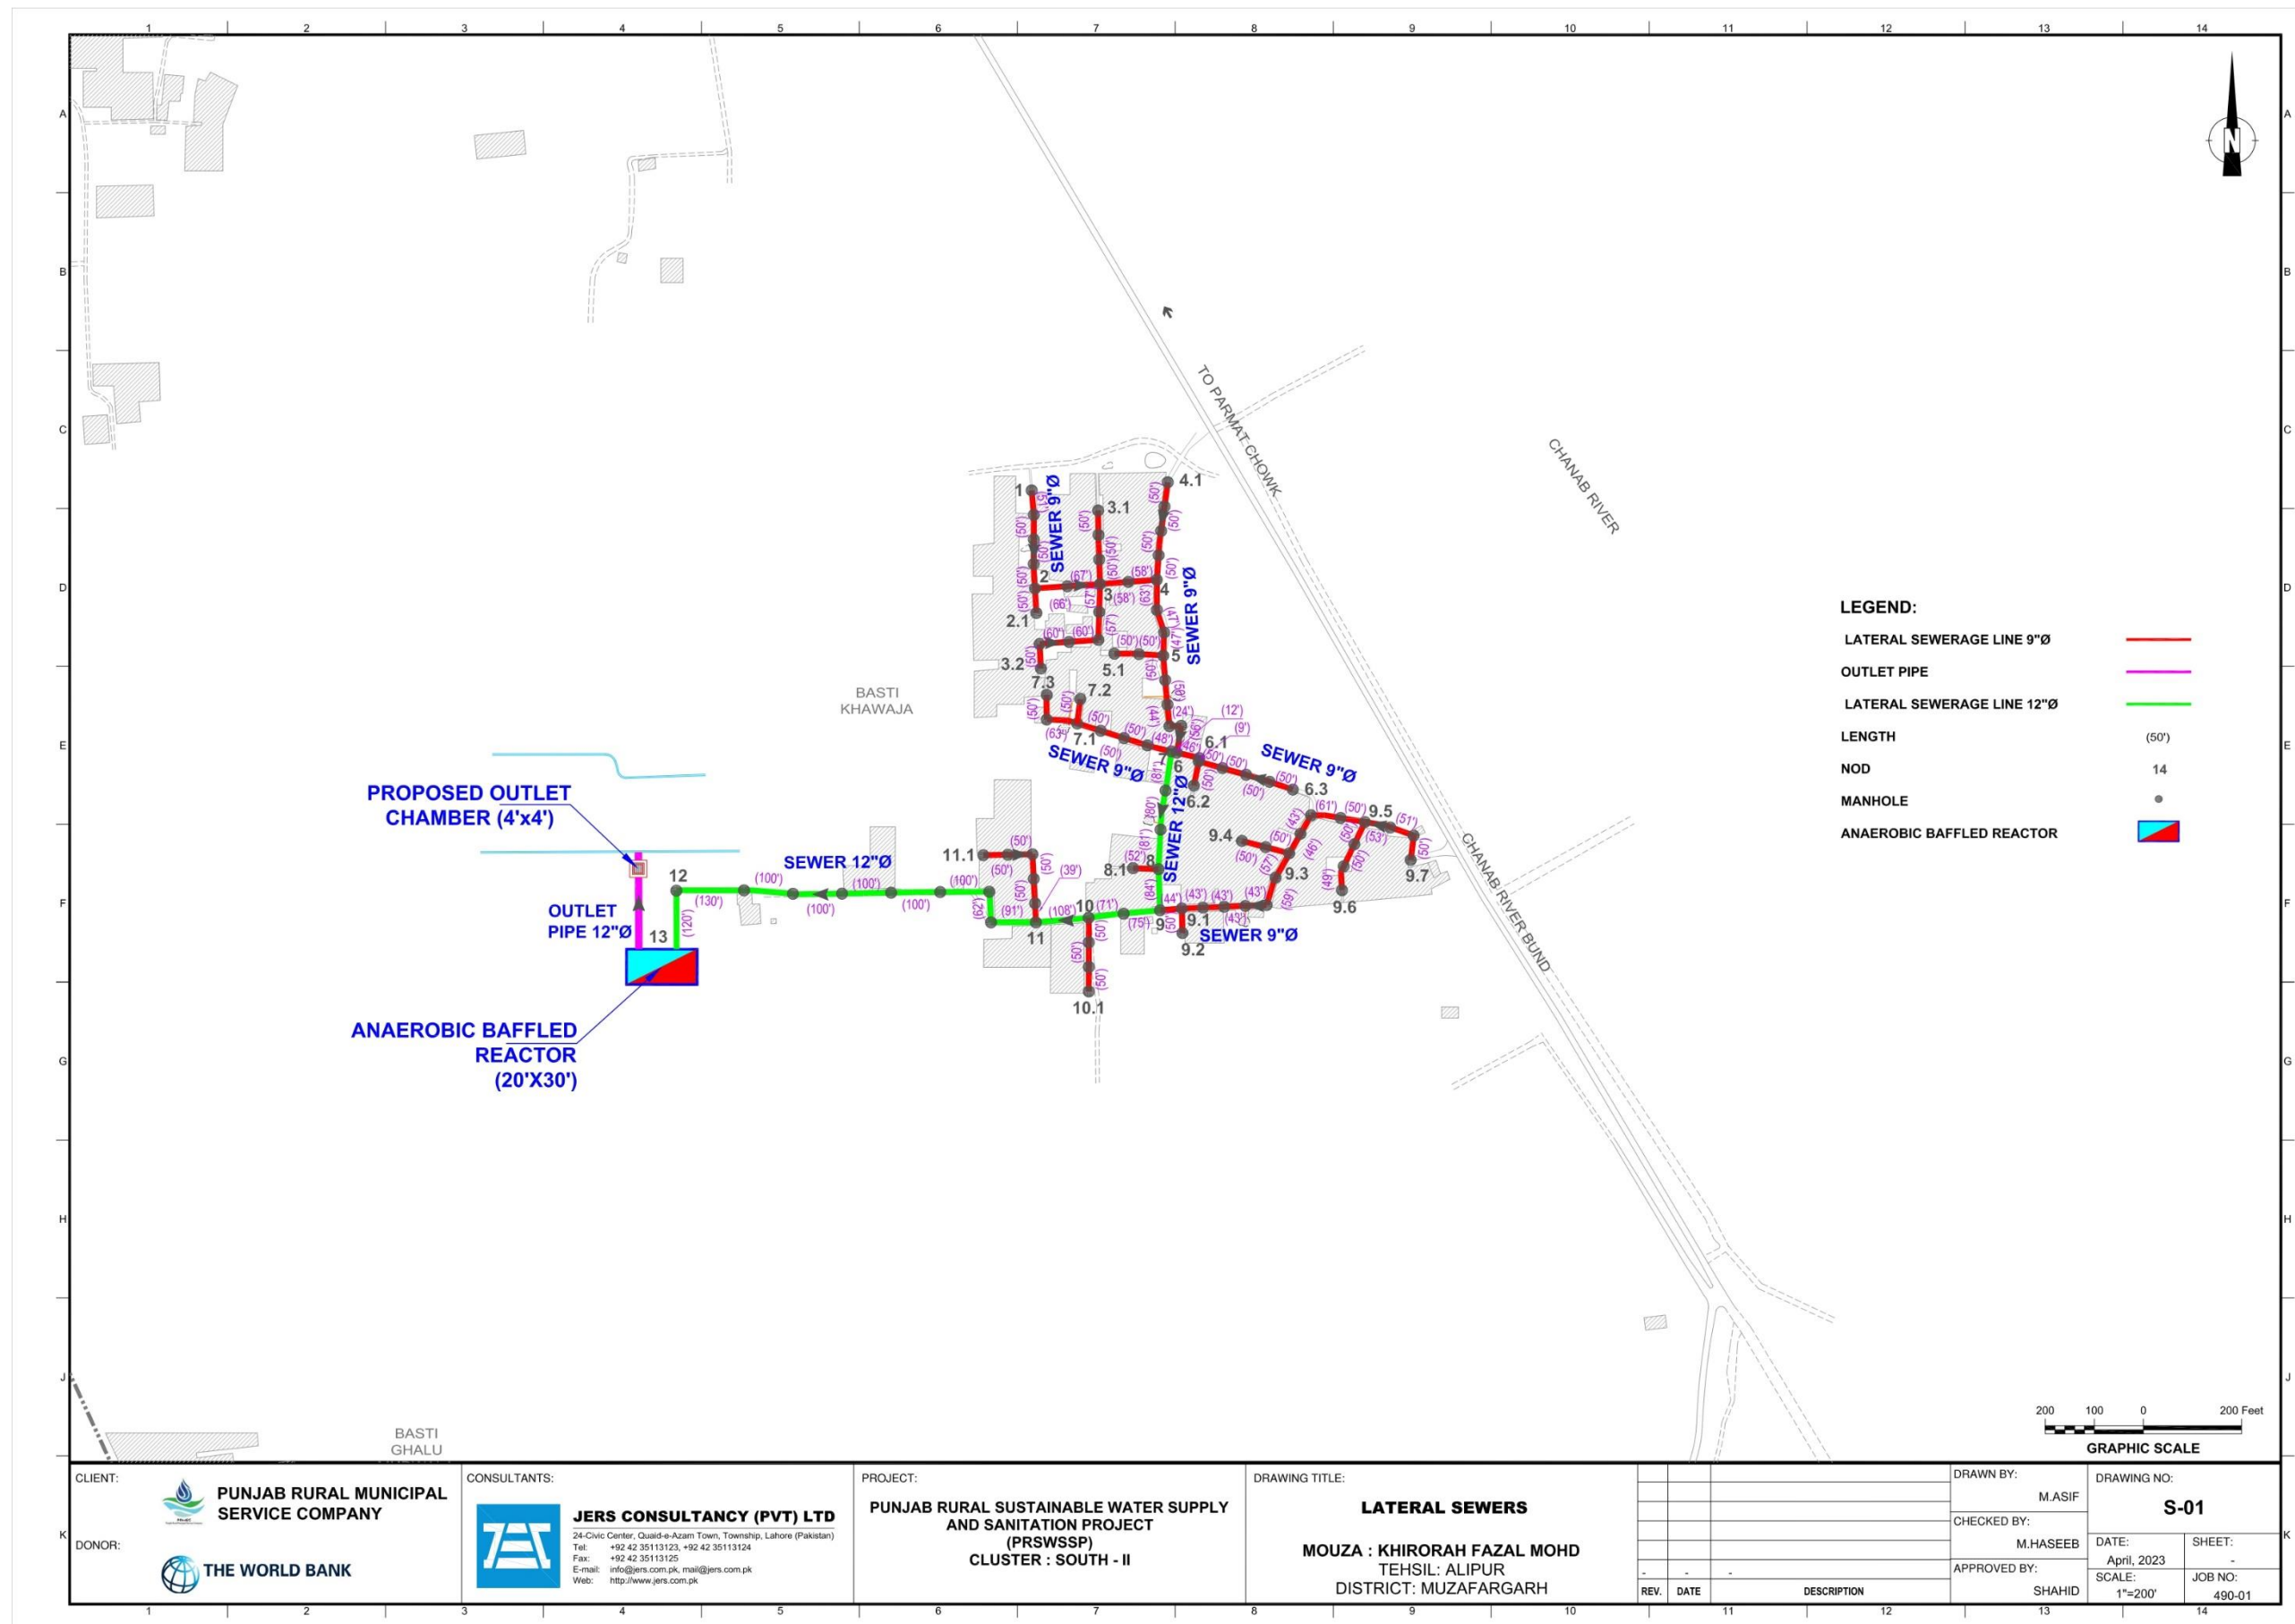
Proposed Sewerage System – Khirorah Fazal
